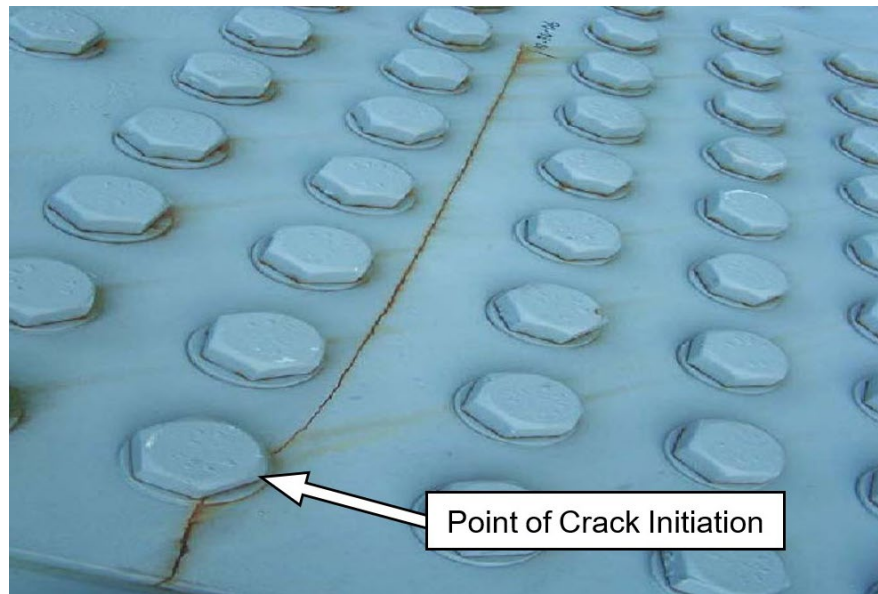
Cracked Gusset Plate and Point of Crack Initiation
